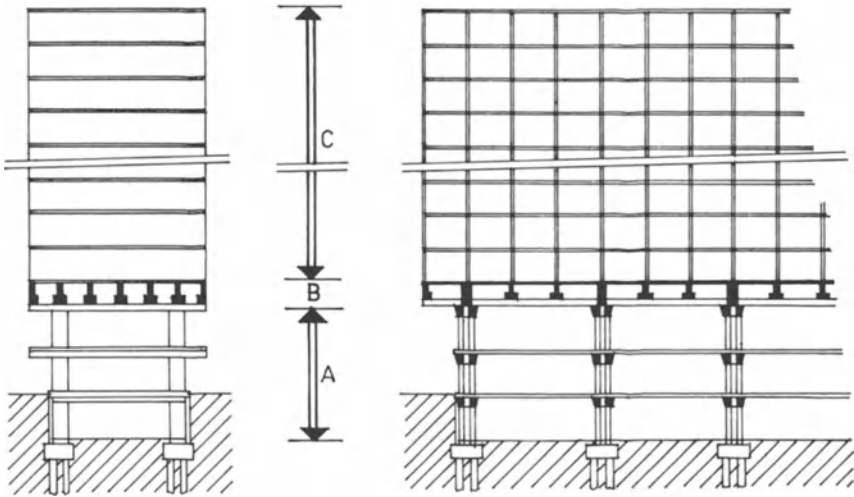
Structure for multiuse buildings with change of loadbearing system in vertical arrangement (A) INTEGRO system/community facilities; (B) transition support structure; and (C) transverse load-bearing wall system/residential part
